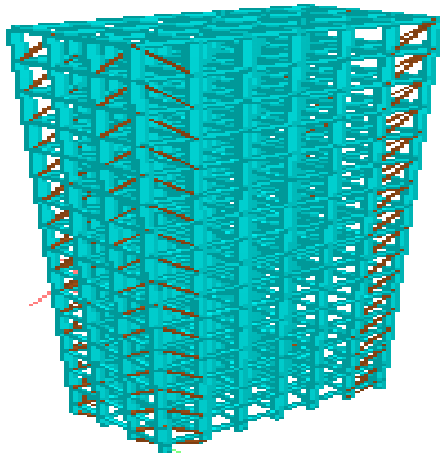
Building with diagonal bracings at outer and inner position (DB3)
